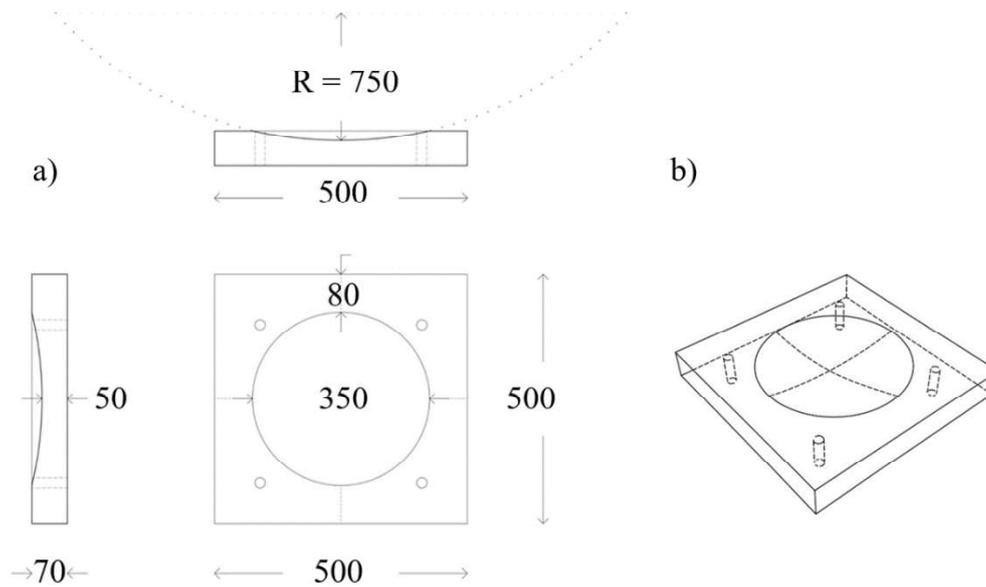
Schematic representation of the utilized concave concrete plates (dimensions in mm); a) Plan and side view, b) 3D view
